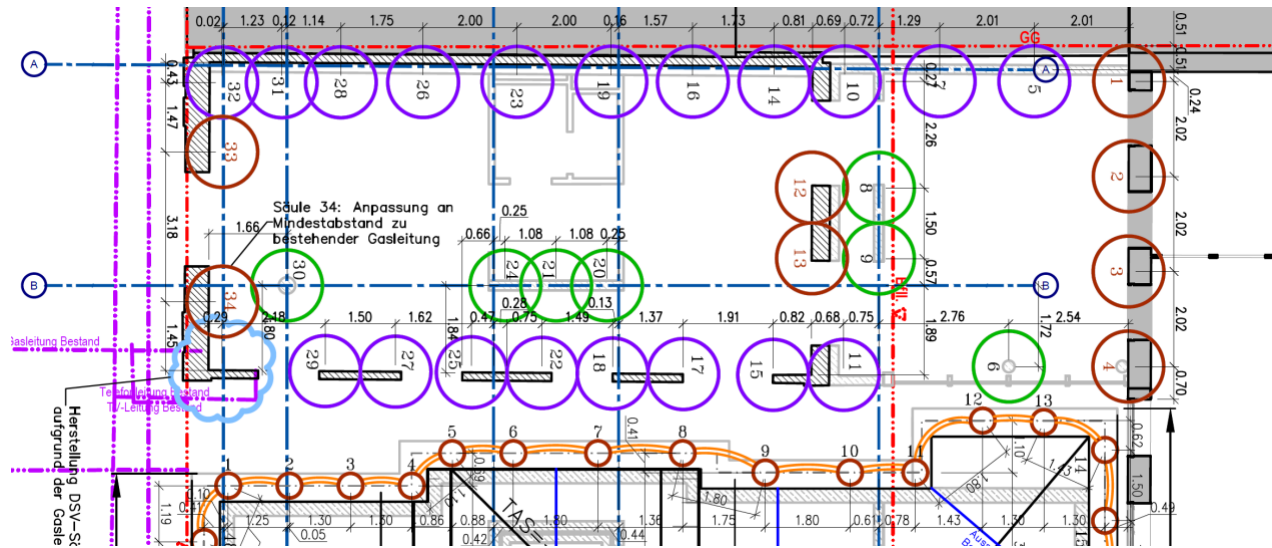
Plan view (ground floor) of the reinforcement works. Green, brown, and purple circles depict JG columns. The actual strip foundation is not shown.
